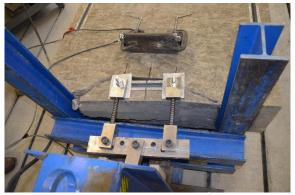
Test series 10 – Concrete failure shear load
